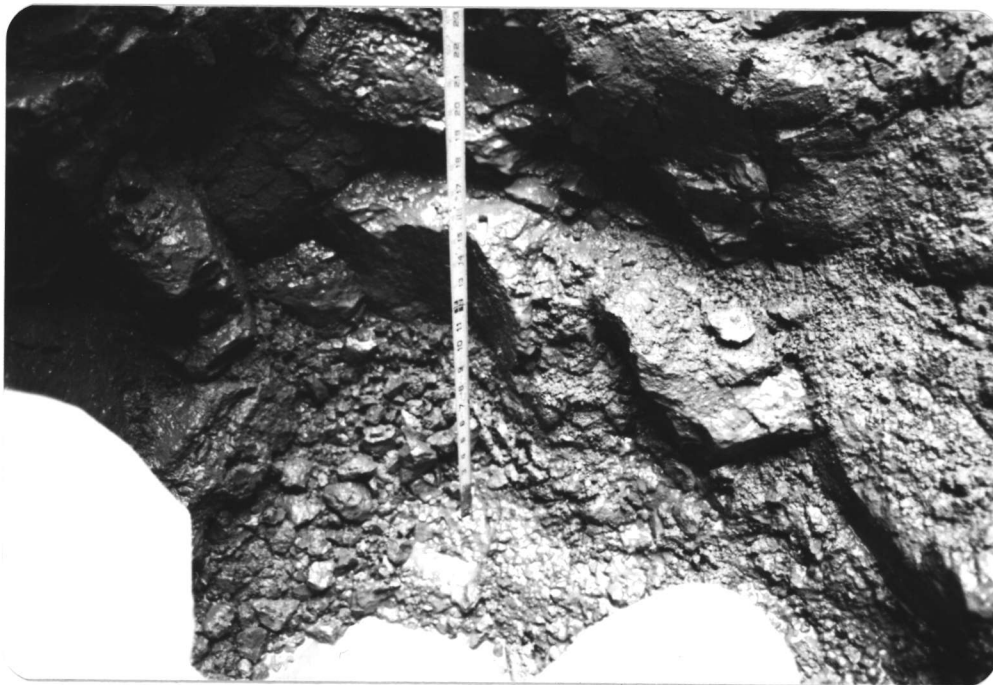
View of north side of test pit from bottom of halfway up. Approximately elevation 246 feet.
